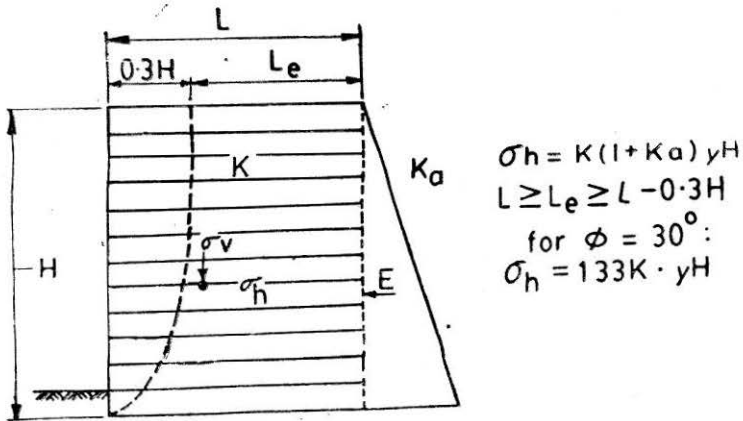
Coherent gravity structure Hypothesis for reinforced earth wall
